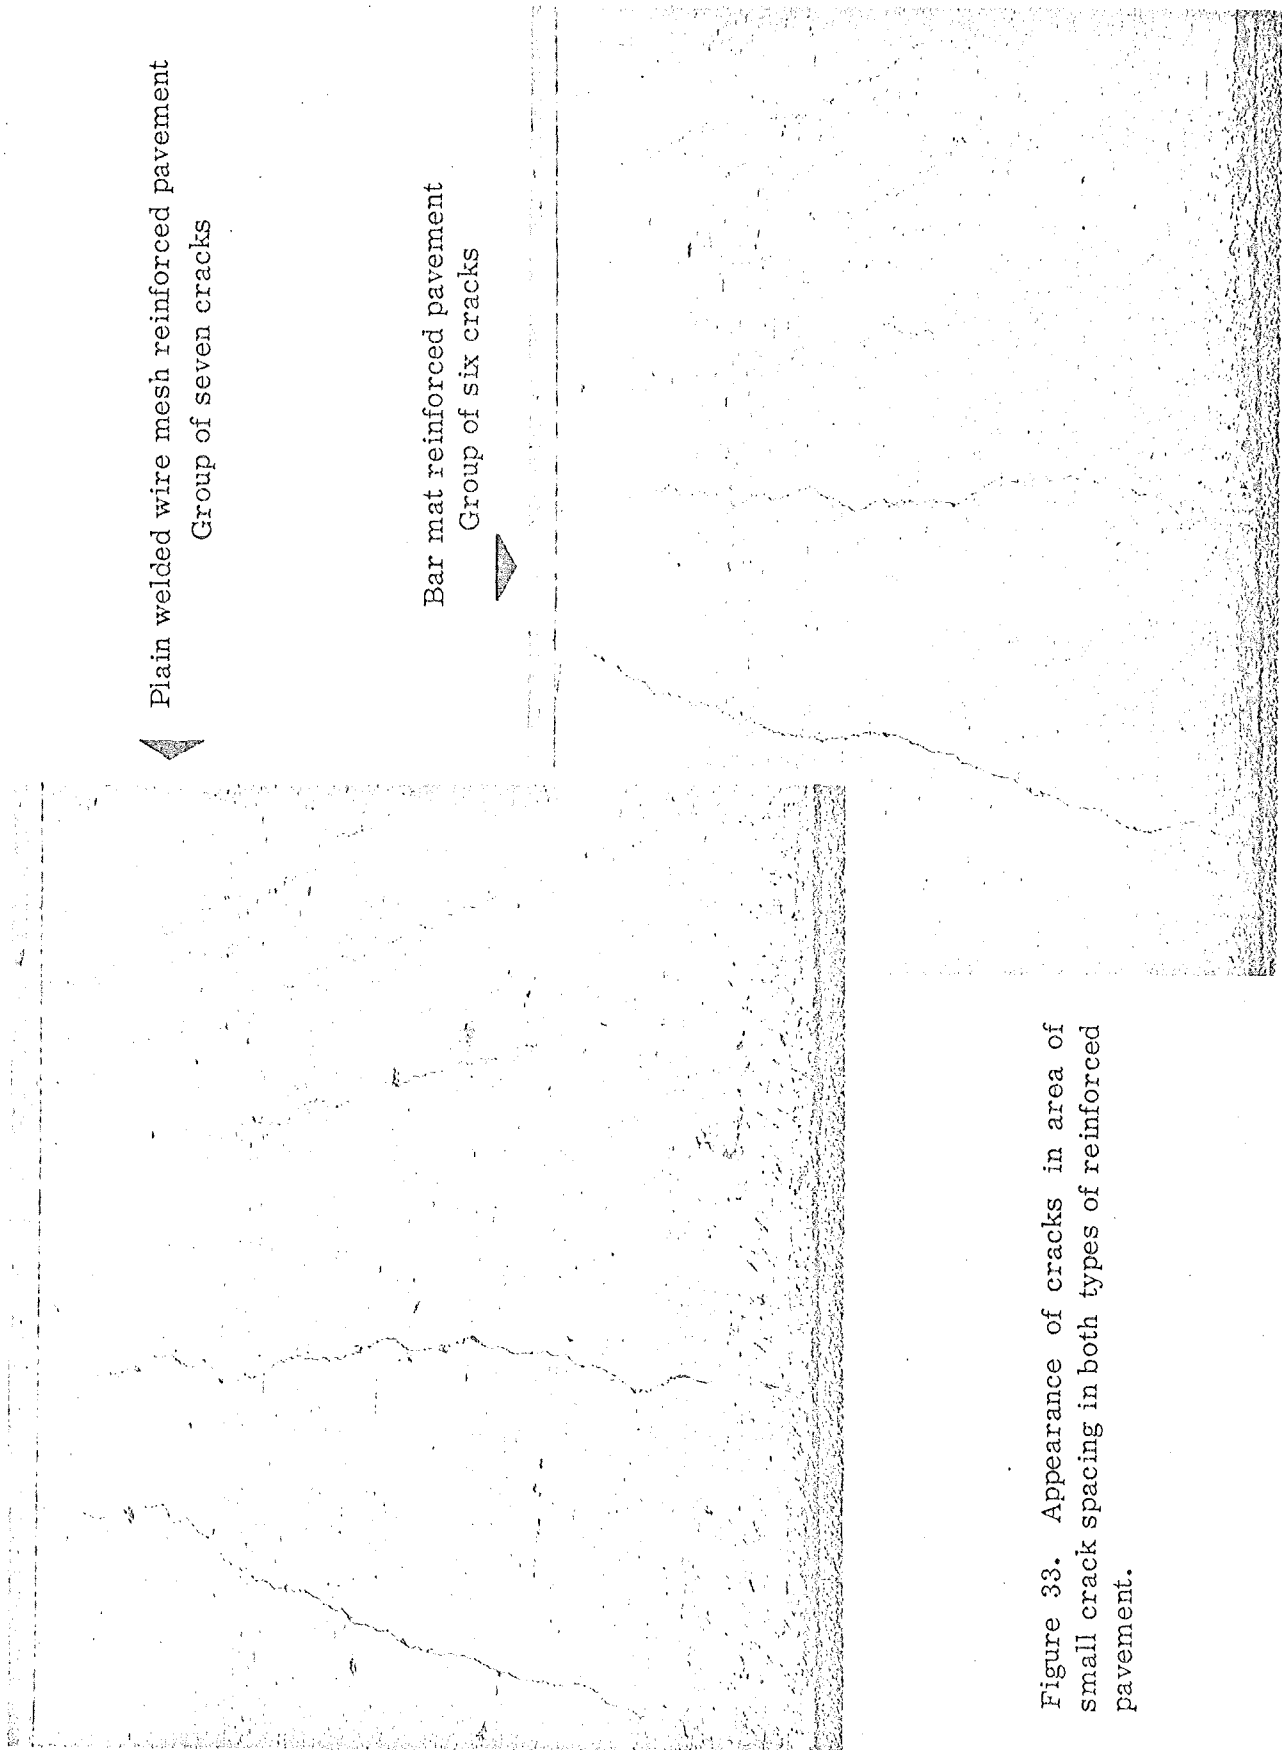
Appearance of cracks in area of small crack spacing in both types of reinforced pavement.
